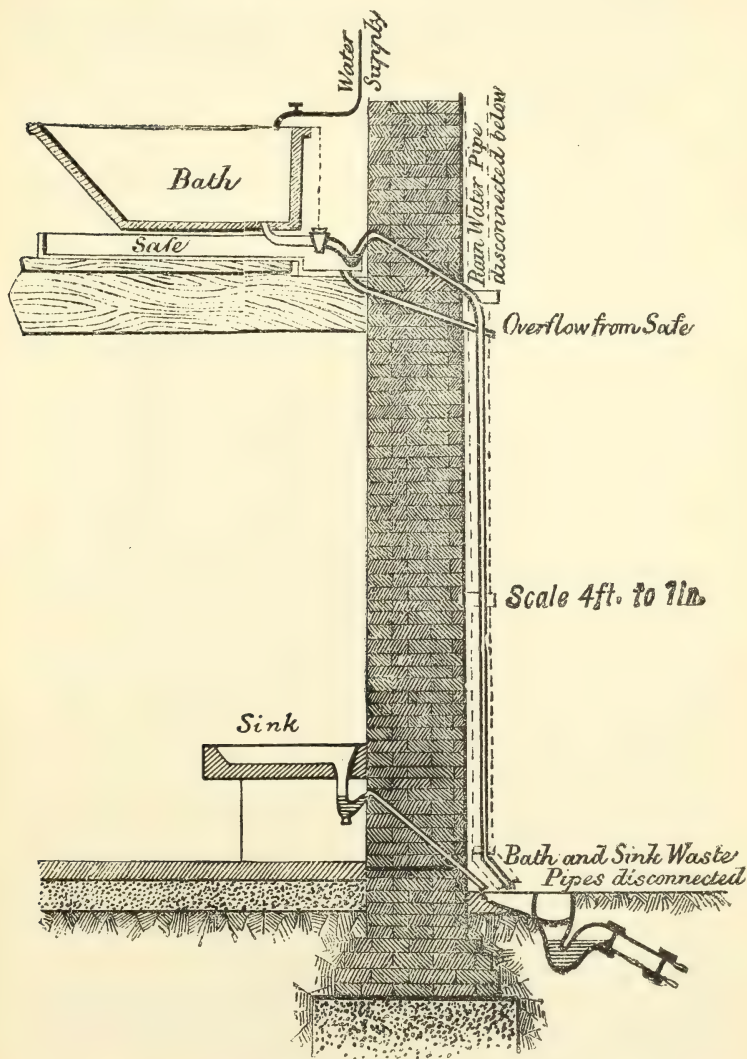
Drainage from sink, bath and rain-water pipe.
